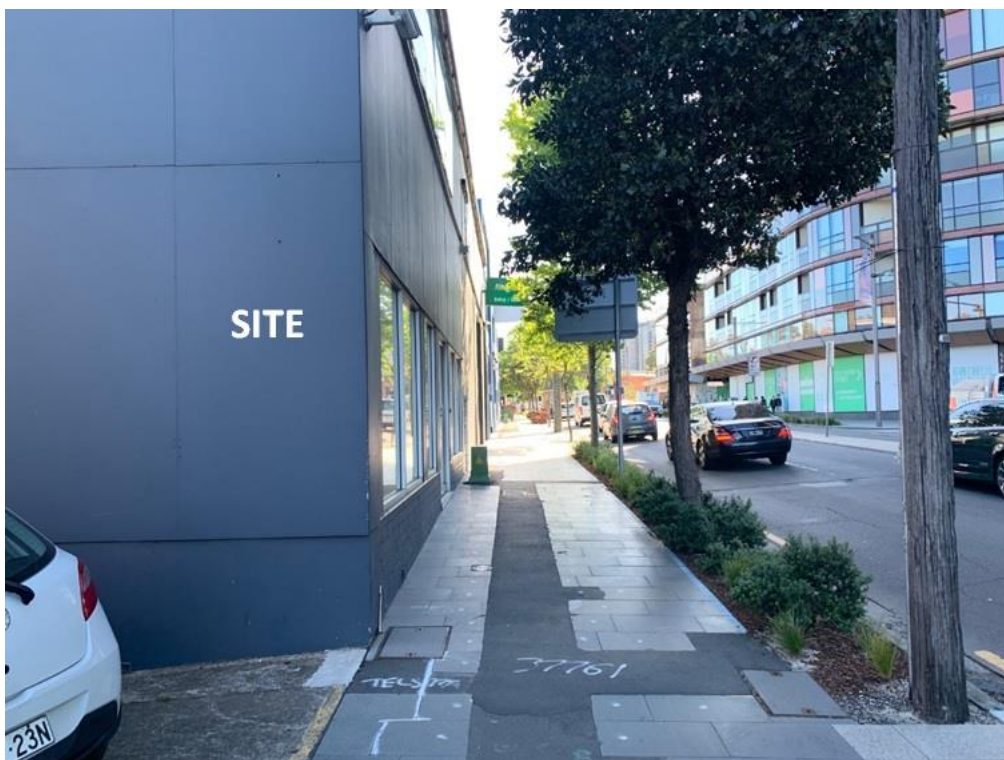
View down Ebsworth Street in the Green Square town centre
